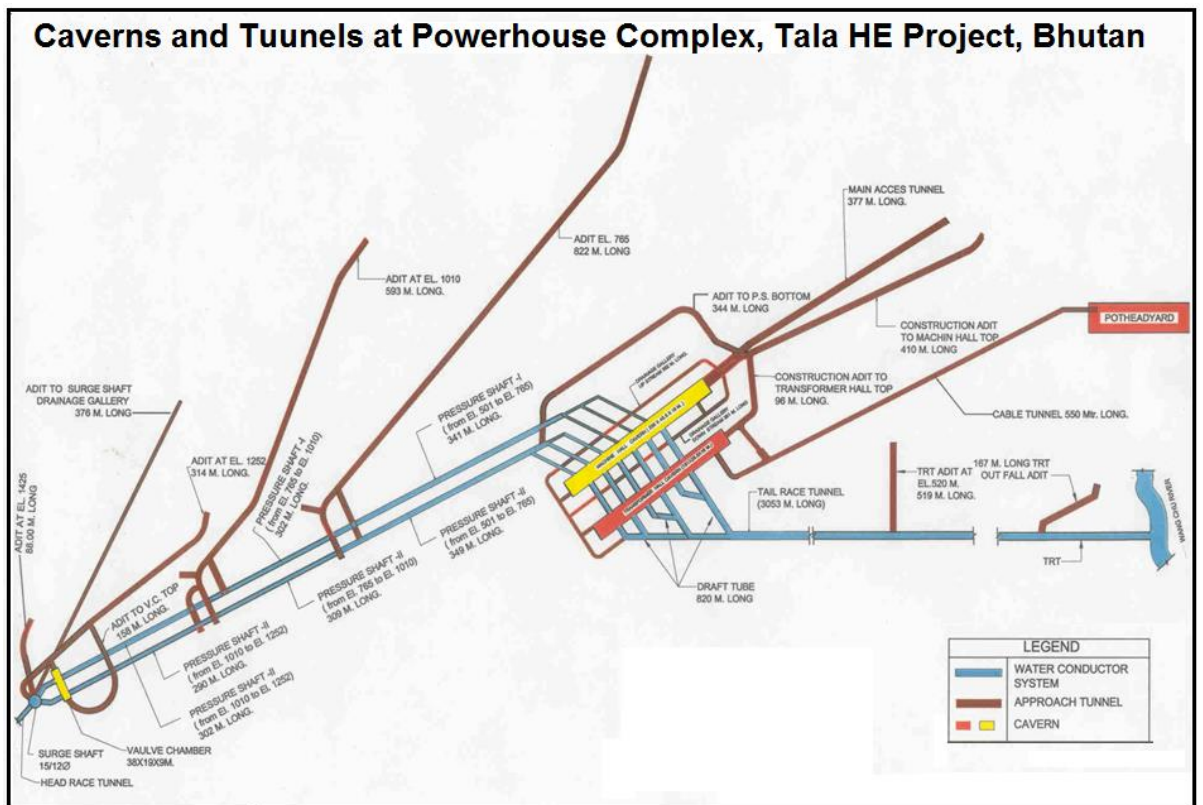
Details of caverns and connecting tunnels at powerhouse complex of Tala Hydroelectric Project, Bhutan
